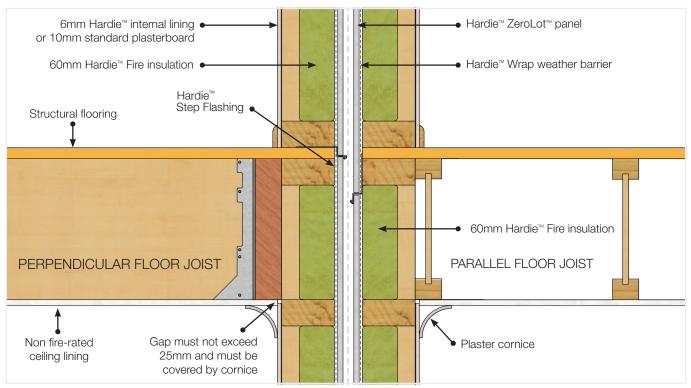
CONTINUOUS WALL FLOOR JUNCTION
